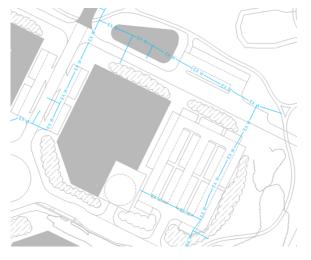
Existing Wessex Water apparatus and proposed Nestor zone
